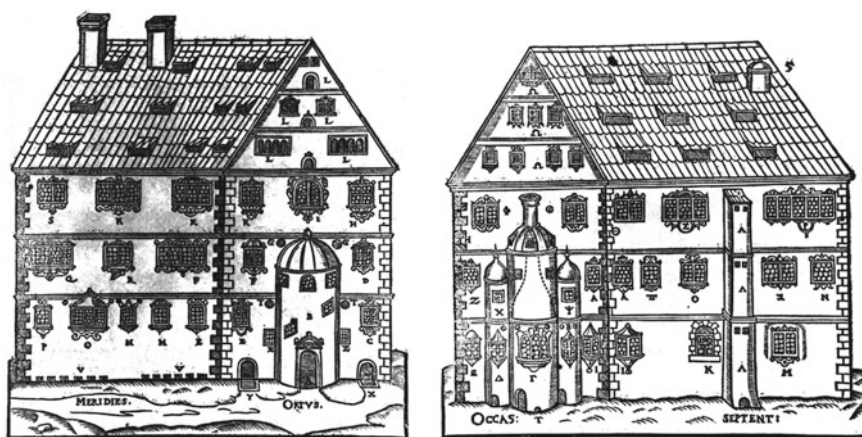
“The Chemical House”: front (southeast) elevation and rear (northwest) elevation
